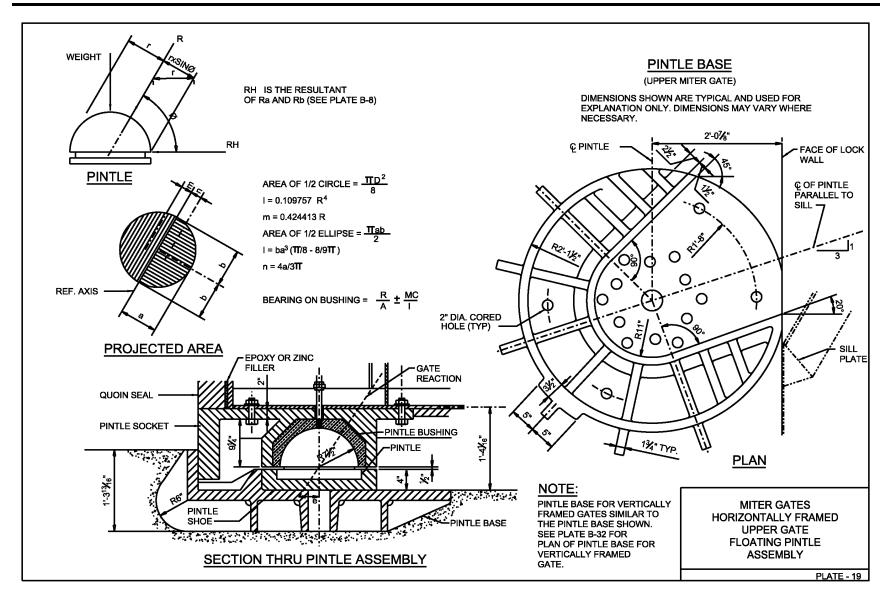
Plate 19: Miter gates, horizontally framed upper gate, floating pintle assembly
